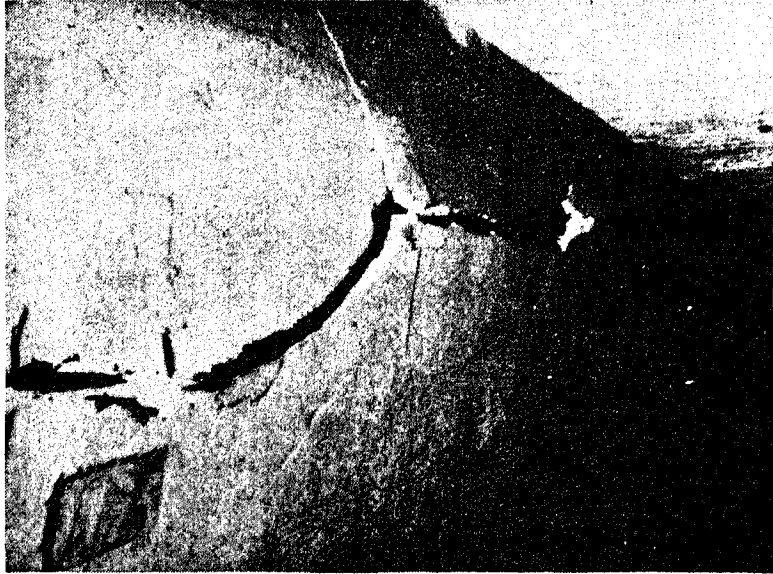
N° 1 Tunnel. The concrete blocks of the tunnel eastern wall have failed under rock pressure.
